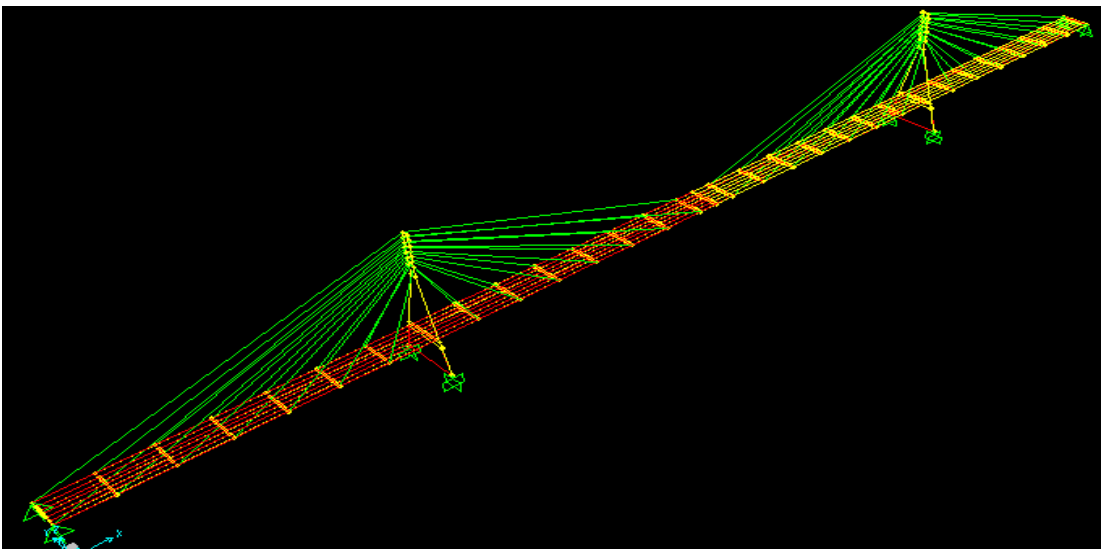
3-D finite element model of inverted-Y shaped pylon cable-stayed bridge
